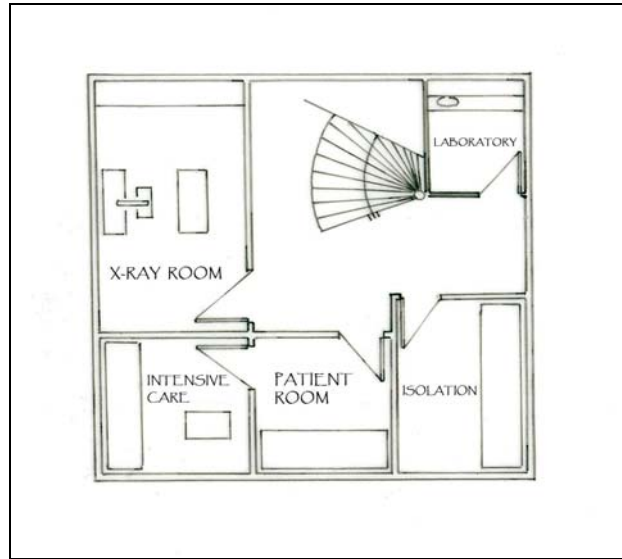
Basement Floor Plan of Ankyra Animal Hospital
